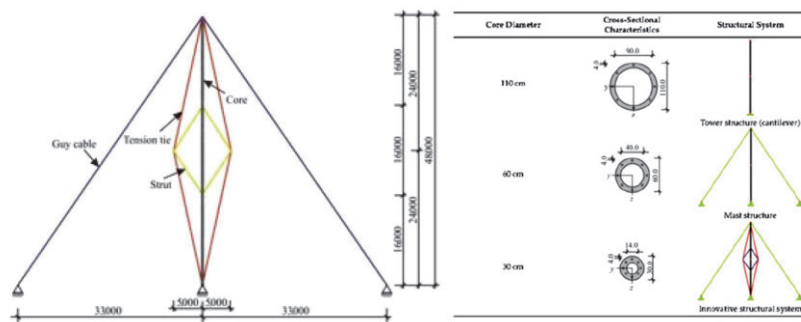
Innovative prestressed stayed-column mast system consisting of a reinforced concrete core, guy cables, tension ties and struts: a) Scheme; b) Comparison of conventional tower, guyed mast and innovative prestressed system. [15]
